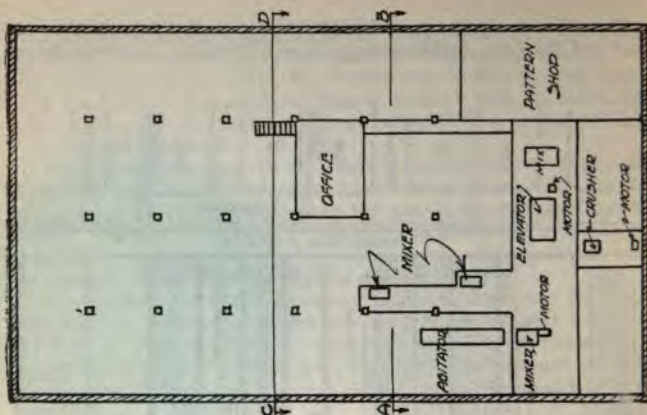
SECOND FLOOR PLAN, PLANT NO. 4
